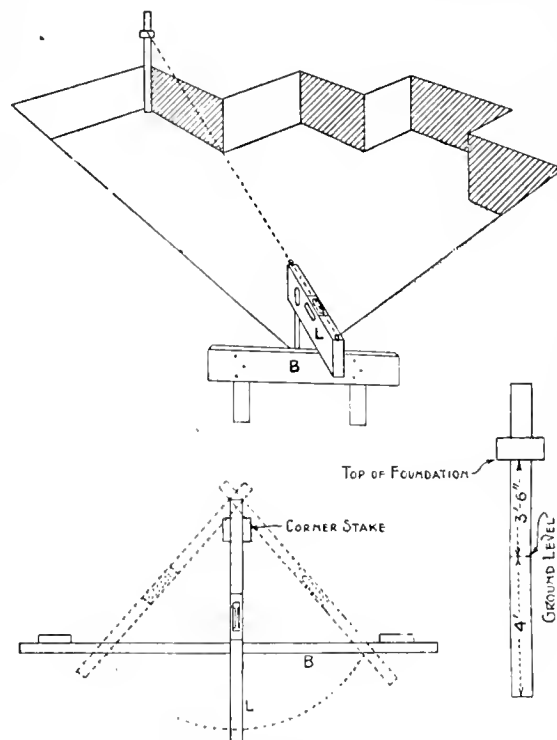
Finding levels for cellar excavations and for foundation walls.
